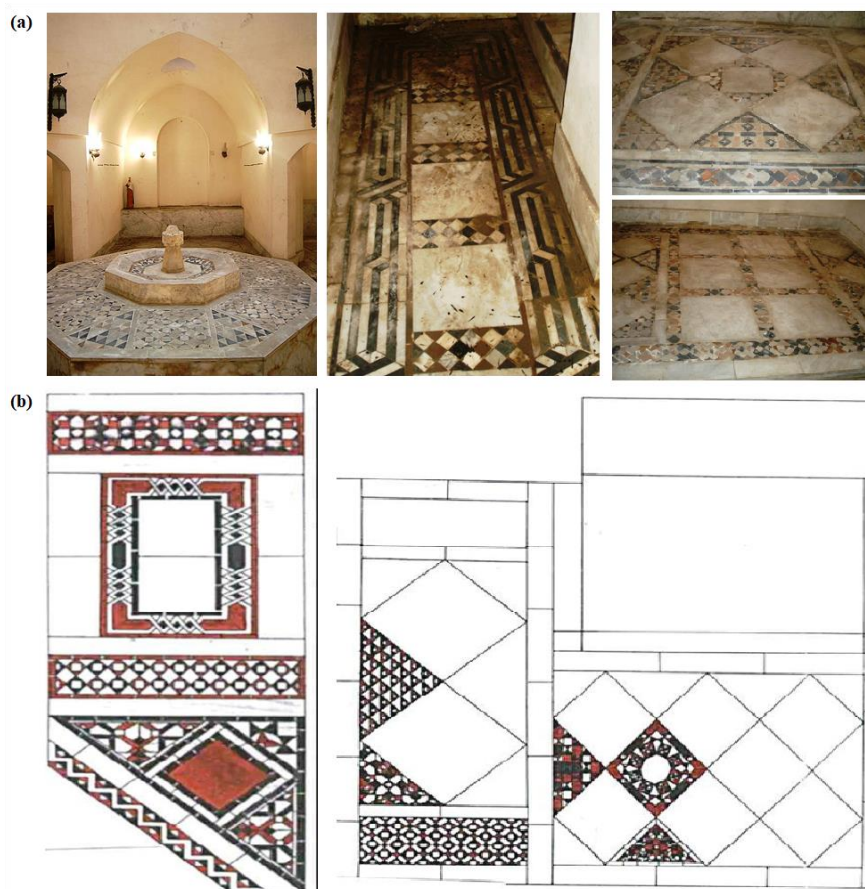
a) Details of the marble mosaic elements, b) Auto Cad drawings of the geometric units of the mosaic.
